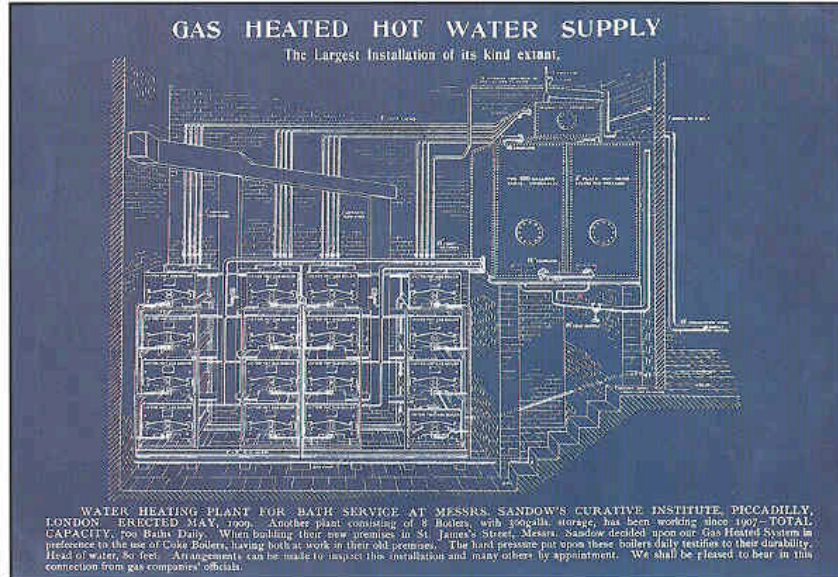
Scheme Drawing. Bath Water Heating Plant, Sandow's Curative Institute, Piccadilly, London, 1909. (Thomas Potterton, *The Heatmakers*, No.4 information wallet, undated).
